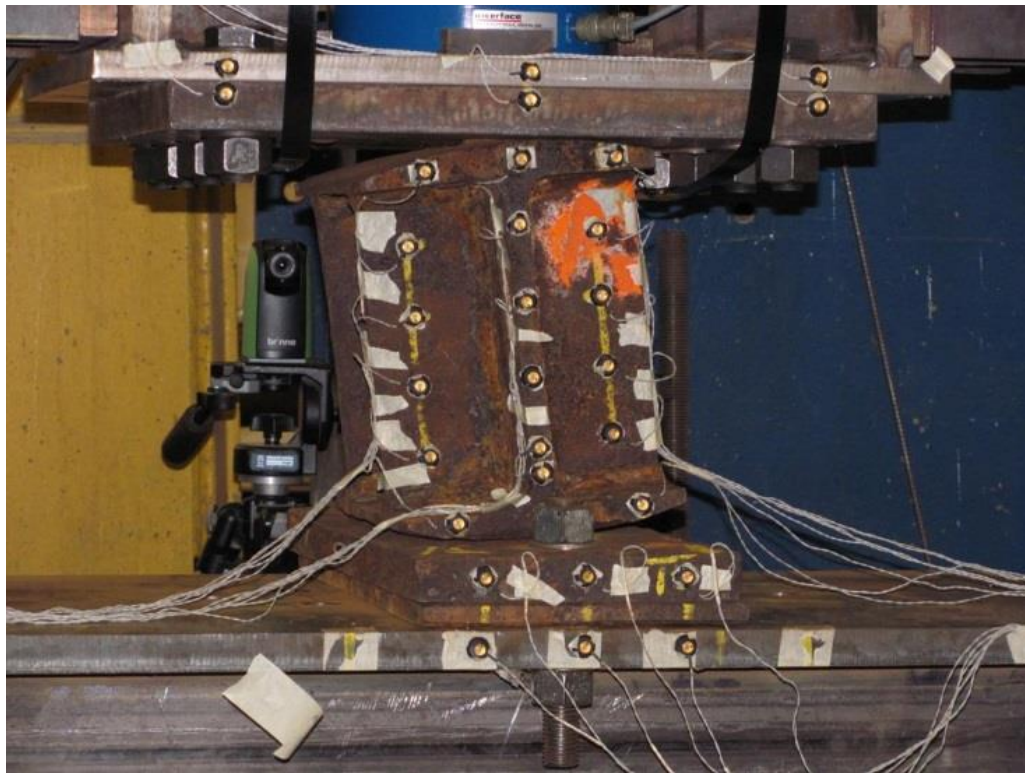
Photograph of the instrumentation used for testing Bearing AR21
